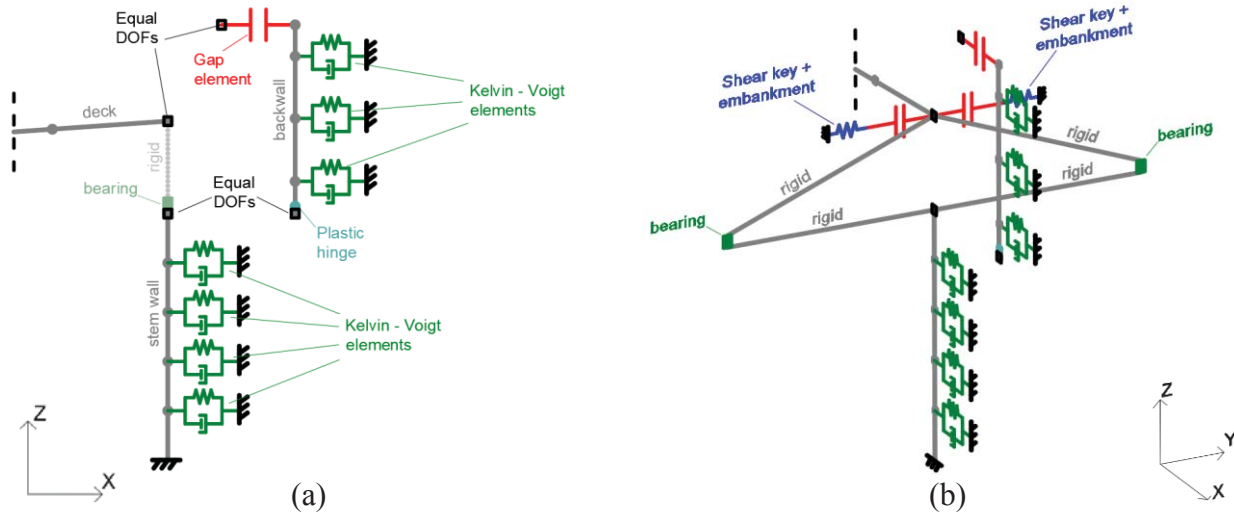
(a) Longitudinal section and (b) 3-d view of the ‘detailed’ abutment-backfill model
